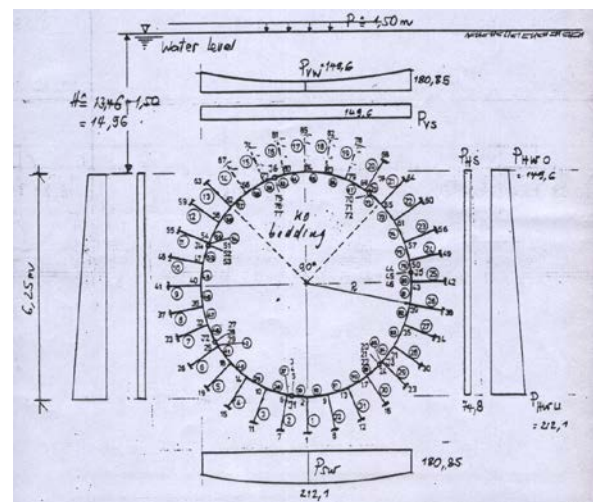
Earth pressures and water pressures acting on tunnel, LC 1
